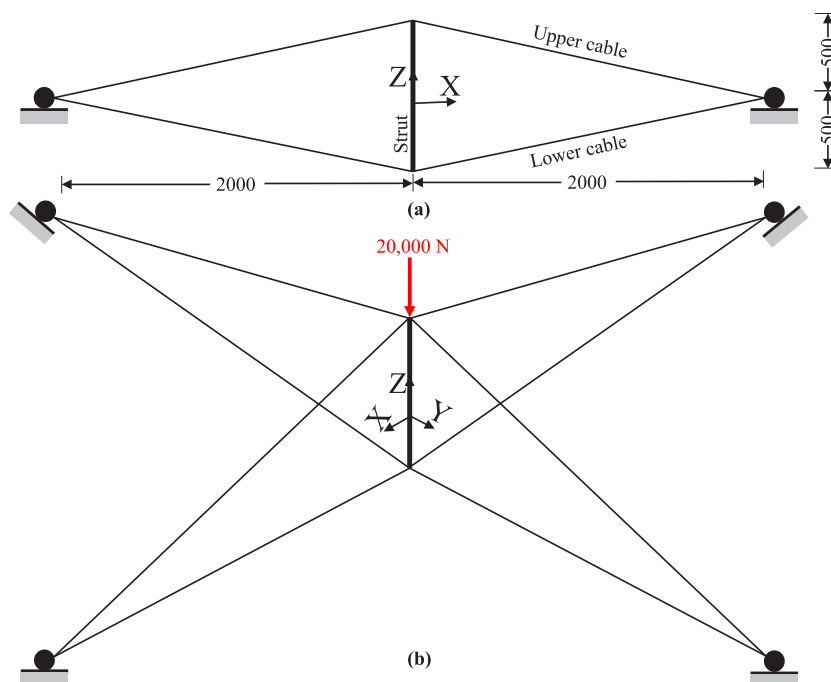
Space cable structure (a) Front view (b) 3D view [21].
